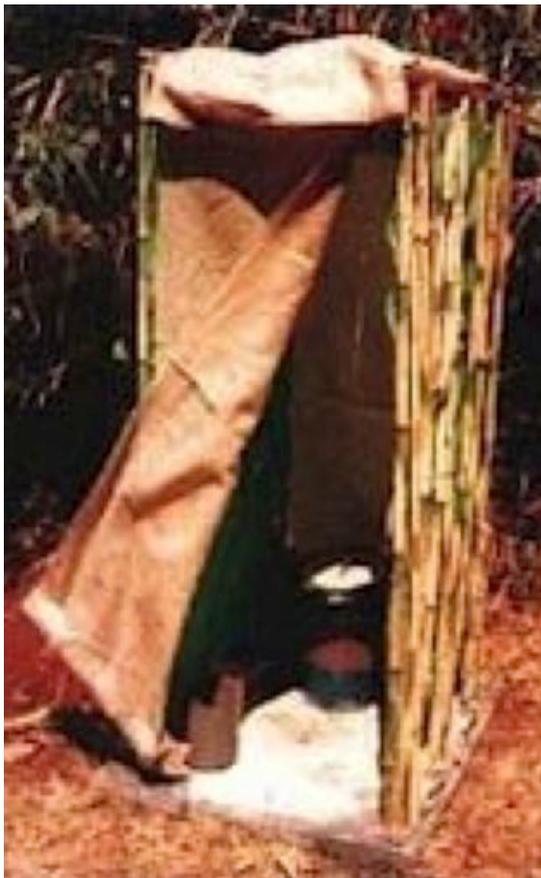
Arbor Loo movable toilet house constructed with bamboo
